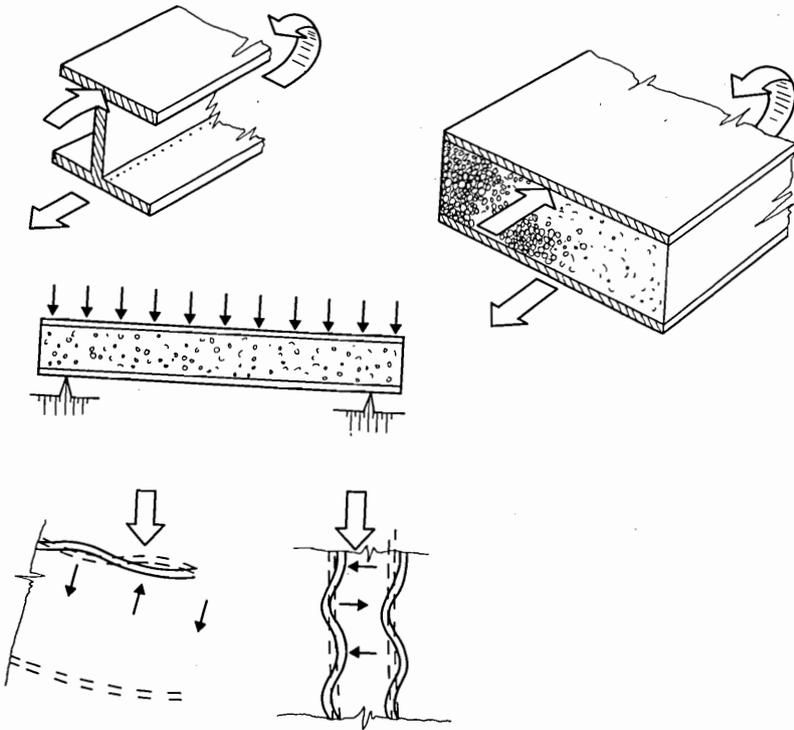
Structural Sandwich, Showing Comparison with I-Beam and Stabilizing Effect of Core against Wrinkling of Facing when Compressed in Beam or Column.
